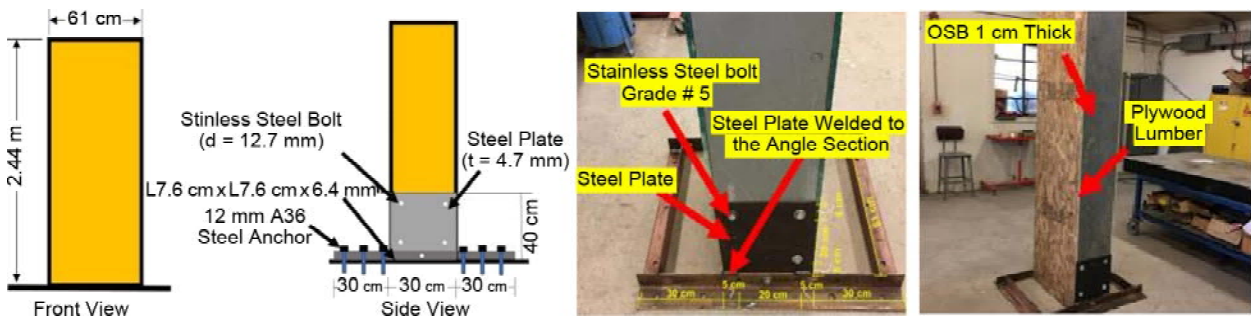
Schematic sketch of the WSaW wall and Connection system details (Hussein et al., 2020).
